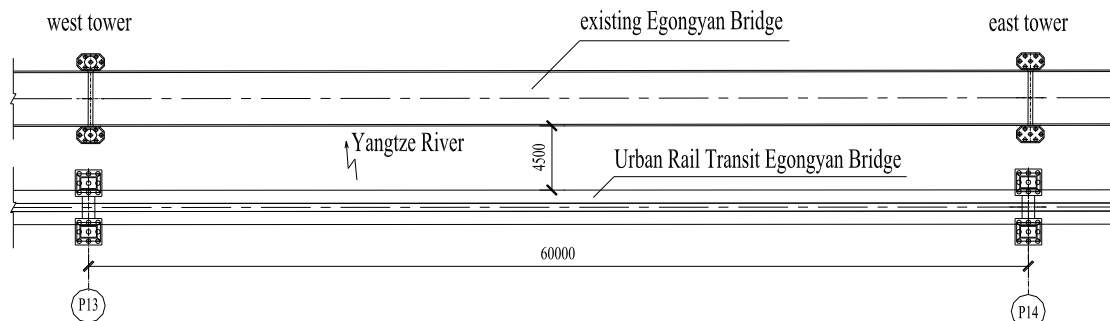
Plan view of Urban Rail Transit Egongyan Bridge and the existing parallel Egongyan Bridge
